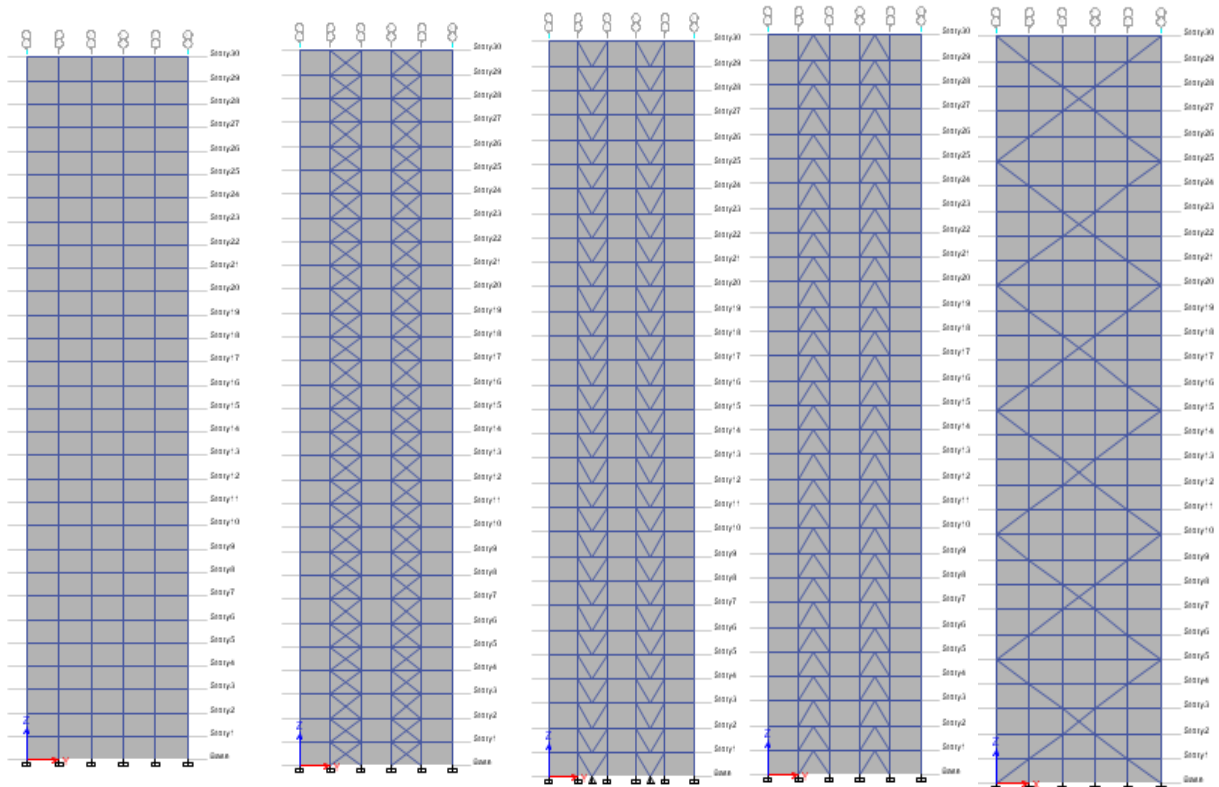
Without bracing Fig 2.2 X-bracing Fig 2.3 V-bracing Fig 2.4 InvV-bracing Fig 2.5 Diagonal bracing
